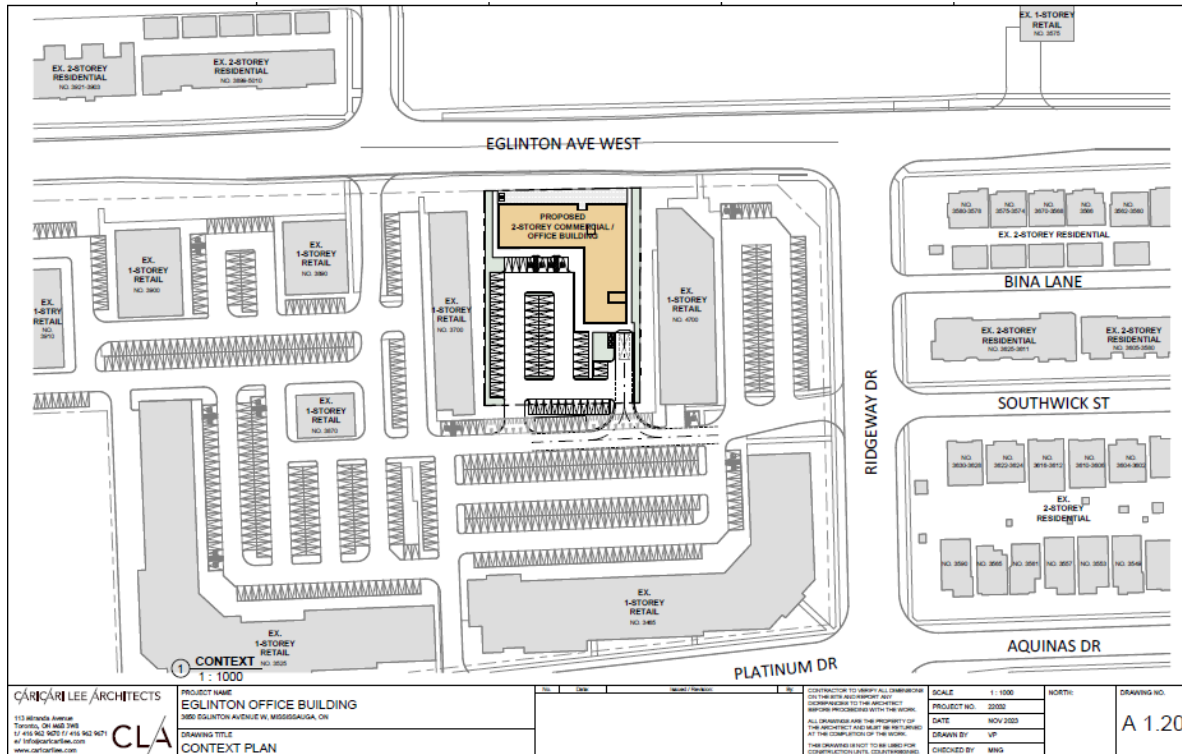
Plan of new commercial/office building, parking areas and surrounding development. (Plan from owner, November 2023.)
